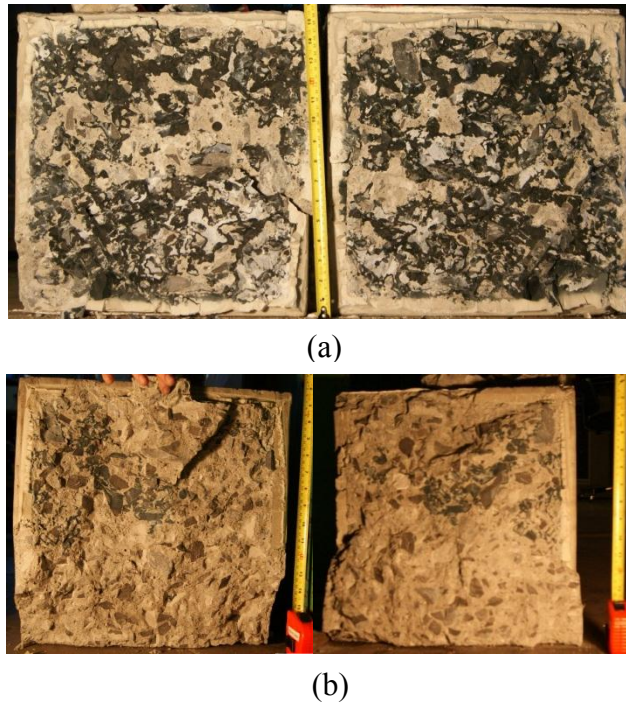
Shear Failure Plane: (a) vertical failure plane – Specimen B; (b) inclined failure
